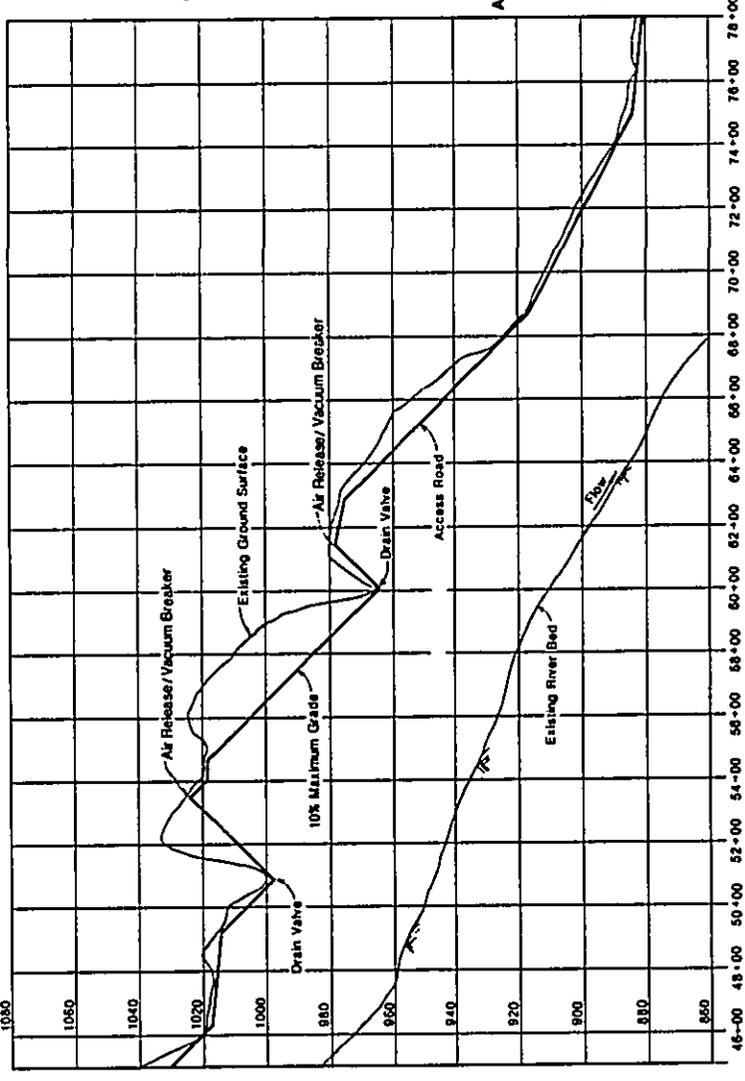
PROPOSED PENSTOCK AND ROAD - Section 1
